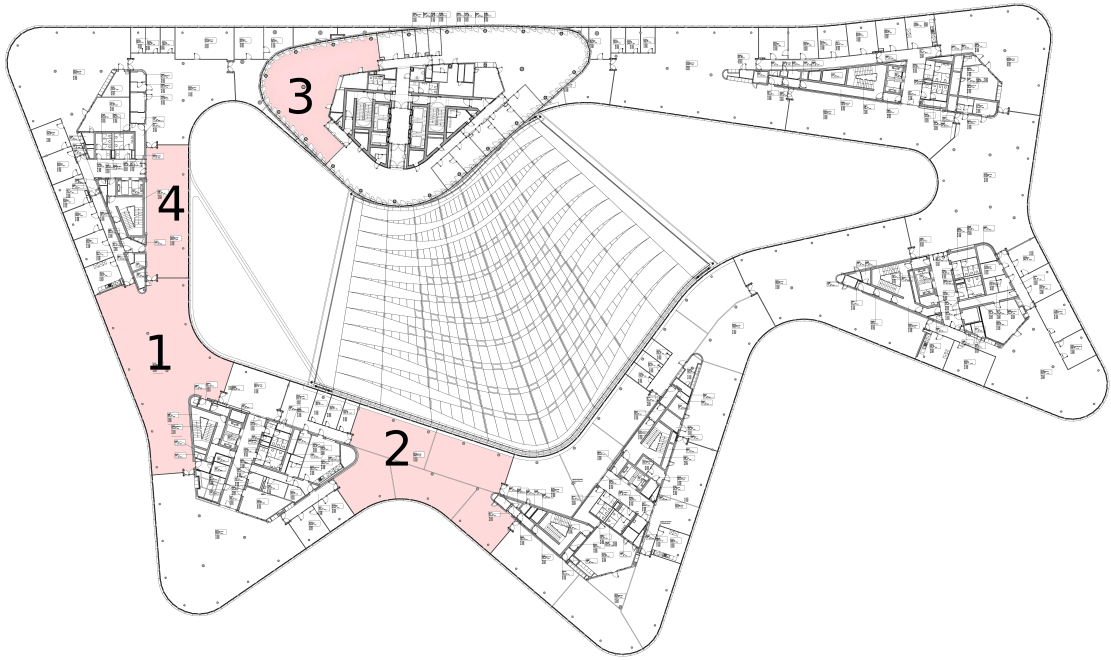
Building A floor plan and monitored open office rooms (on multiple floors)
